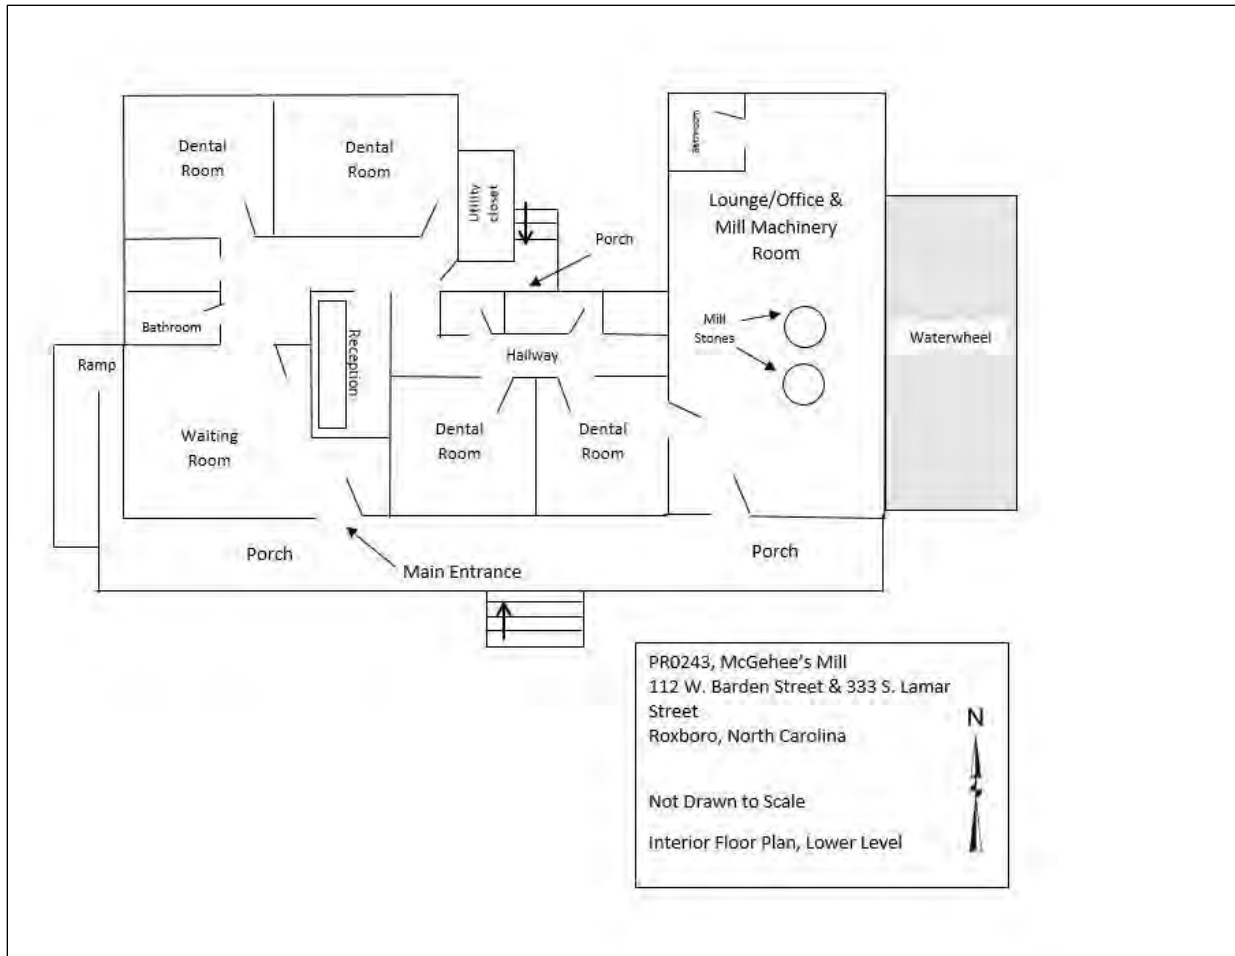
McGee's Mill (PR0243) Interior Floor Plan, Lower Level.
